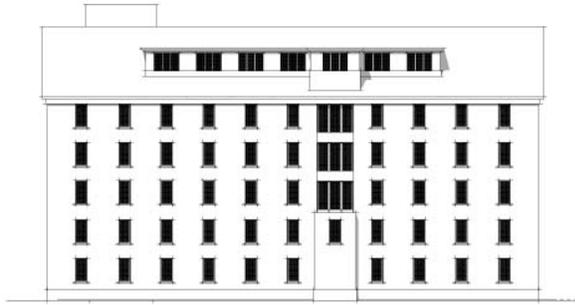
Repeated bays of a medium urban building are interrupted by a vertical building element.
